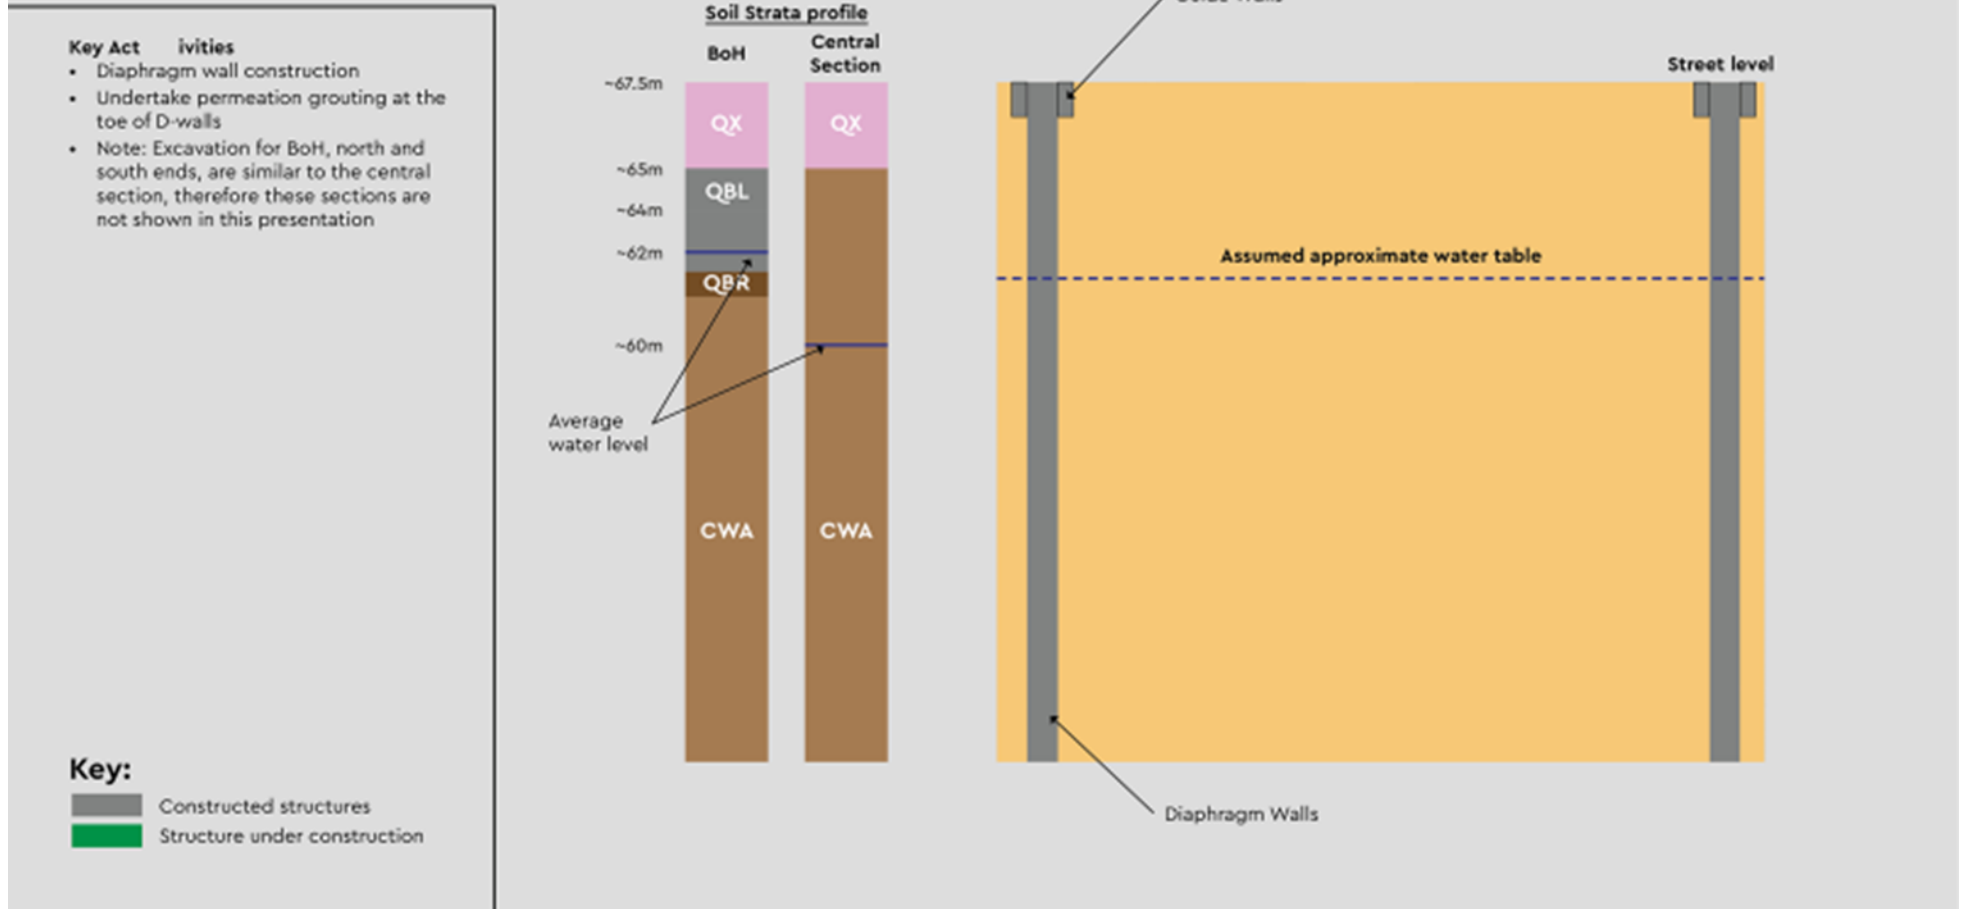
Dublin Airport Station Stage 2 - Diaphragm Walling
